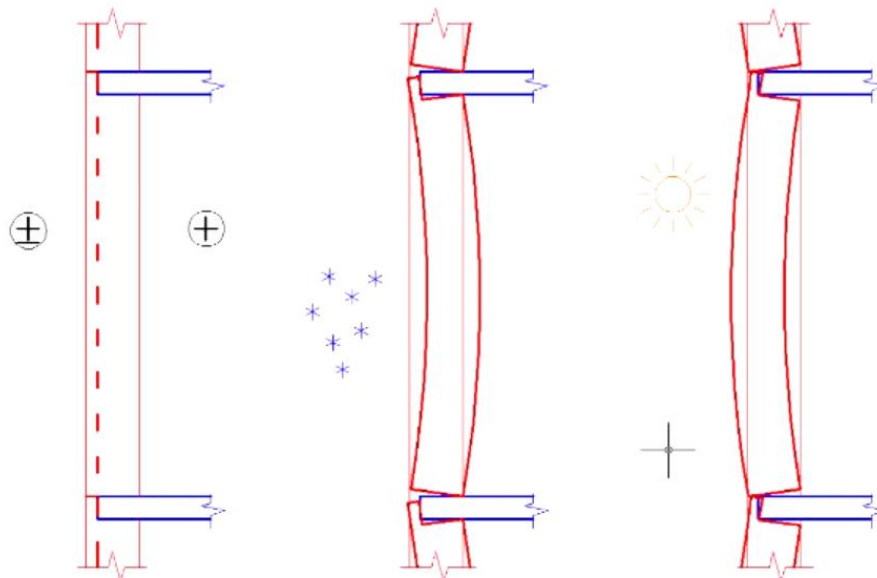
Deformations of the wall (Image: Maria Kupriyanova)
